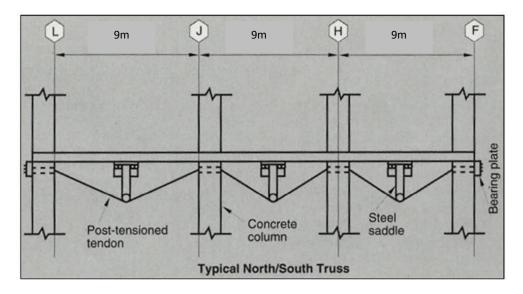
Section 2 of Figure 2.16, showing north/south truss. The post tensioning tendons taking the downward forces acted on the short steel saddles and transferring to the exiting RC columns (Repair & Retrofit using External Post Tensioning)
